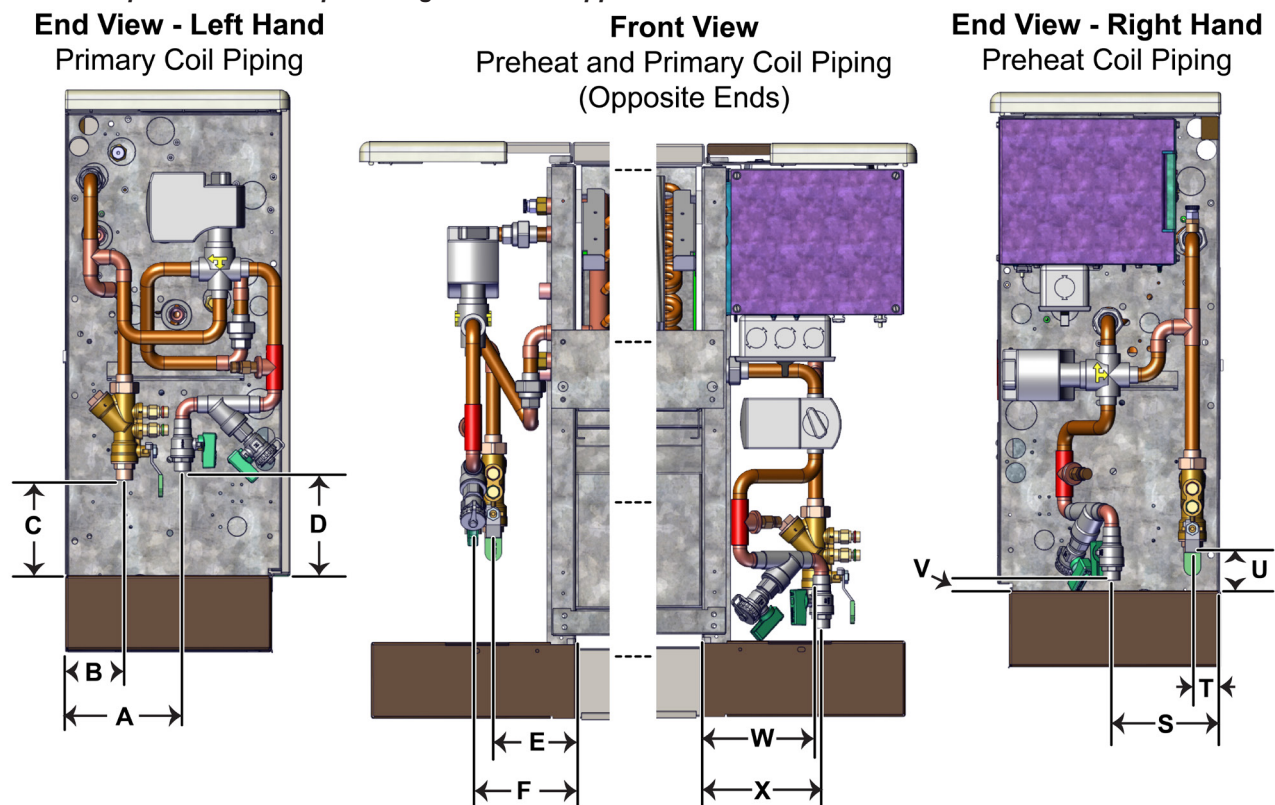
Hook Up Locations: 2-Pipe Arrangement
